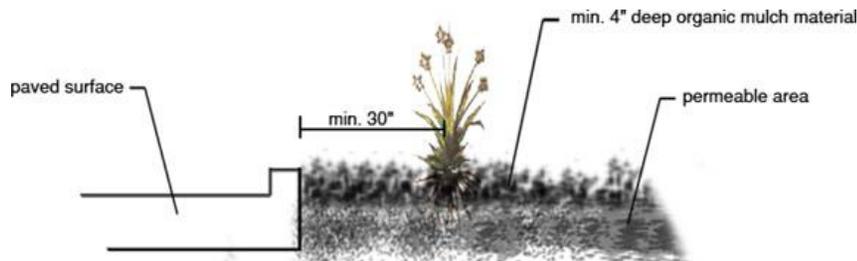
This shows the minimum distance needed between the street parking and actual plants in the bioswale.
